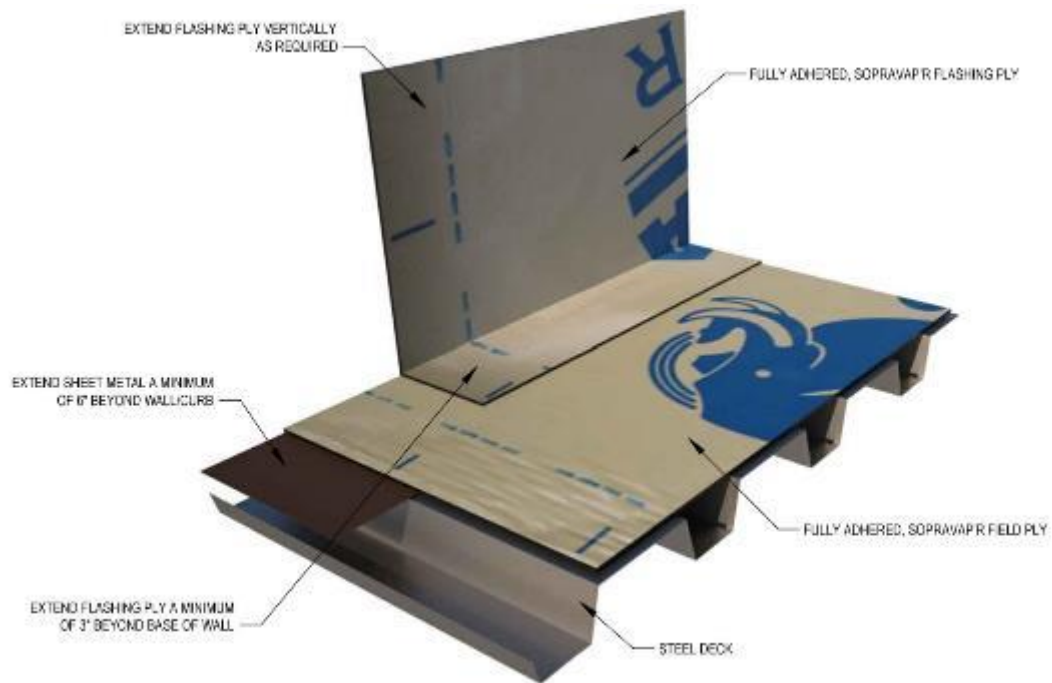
Fully Adhered, Self-Adhesive SOPRAVAP'R Flashing at Wall/Curb On Steel Deck
